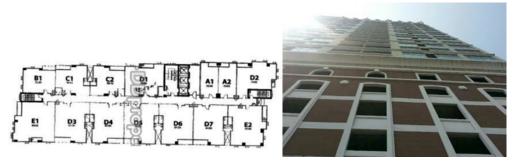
The pictures of privacy supportive characteristics of Condominium CB03 (Left) the typical floor plan, (Right) the building's floor stacking
